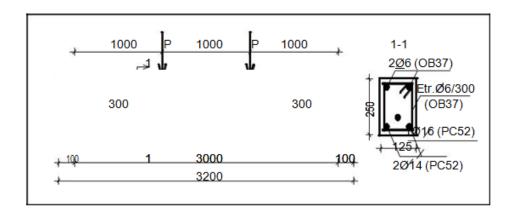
Longitudinal and cross section – reinforcing and loading manner
